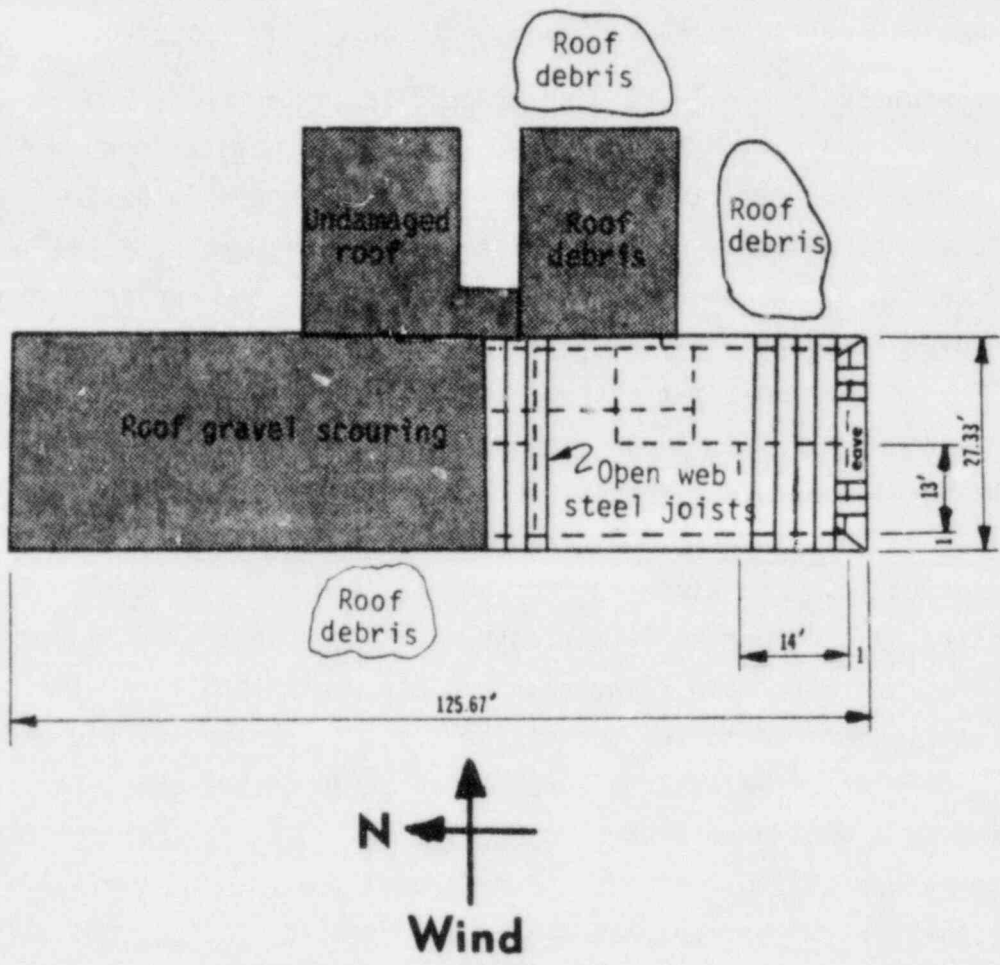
Plan view of the Communications Building showing windward roof damage (unshaded portion).
